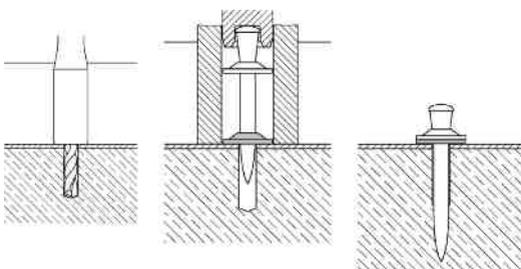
Procedure: Fastening profile metal sheets to concrete using powder-actuated fasteners
